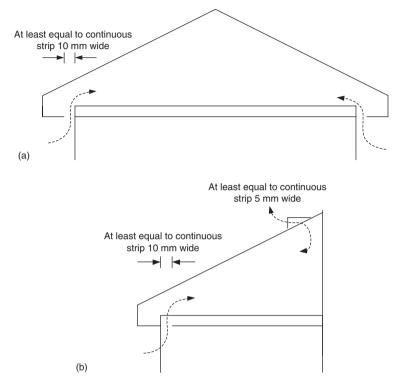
Ventilating roof voids. (a) Pitched roof. (b) Lean-to roof
